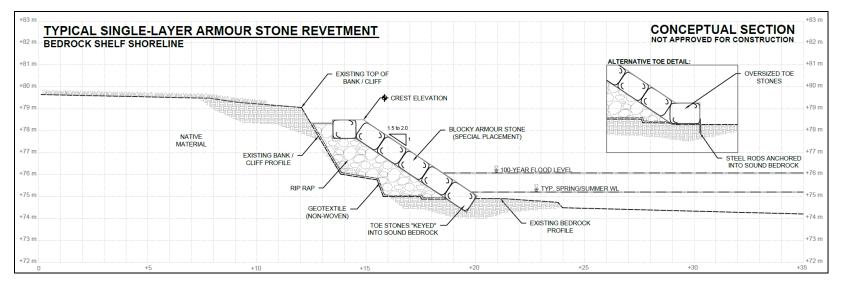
Typical single-layer armour stone revetment founded on a bedrock shelf (concept only)
